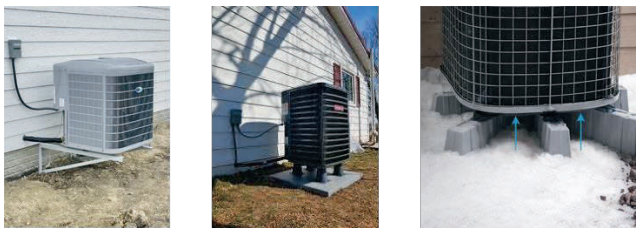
Examples of heat pumps on a wall mounted bracket, a riser pad, and a 5-star Pad
